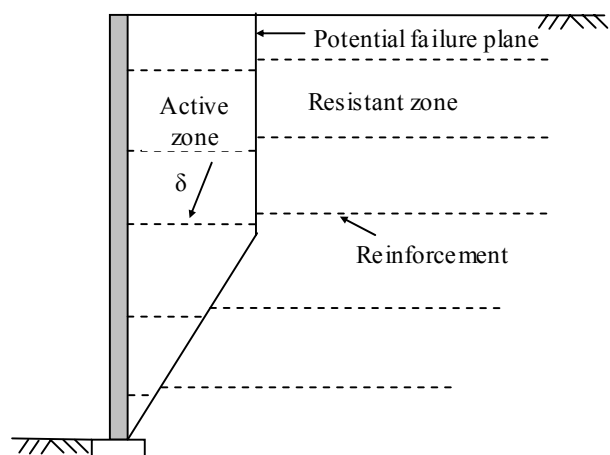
Oblique pullout of reinforcement, bilinear failure mechanism
